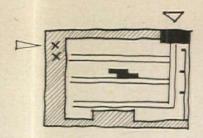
A suggested downtown store design is a rectangle with helix ramp leading to parking floors sandwiched between selling floors, all served by central moving stairways. See also Dayton's St. Paul store, page 170
